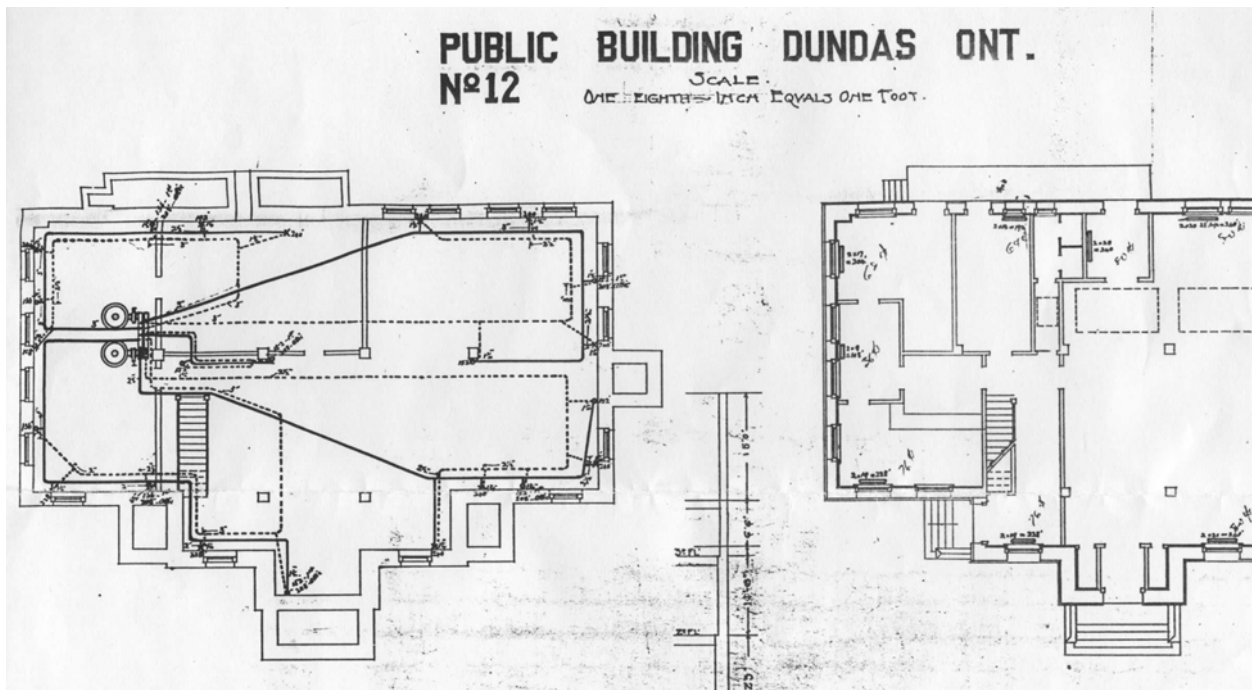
Section of drawing No. 12 (1911) with all four floor plans, showing the Basement Floor Plan (left). The two circular objects appear to be water tanks with solid and dashed lines indicating the location of hot and cold water pipes. The room to the right at the back of the building was the boiler room.
